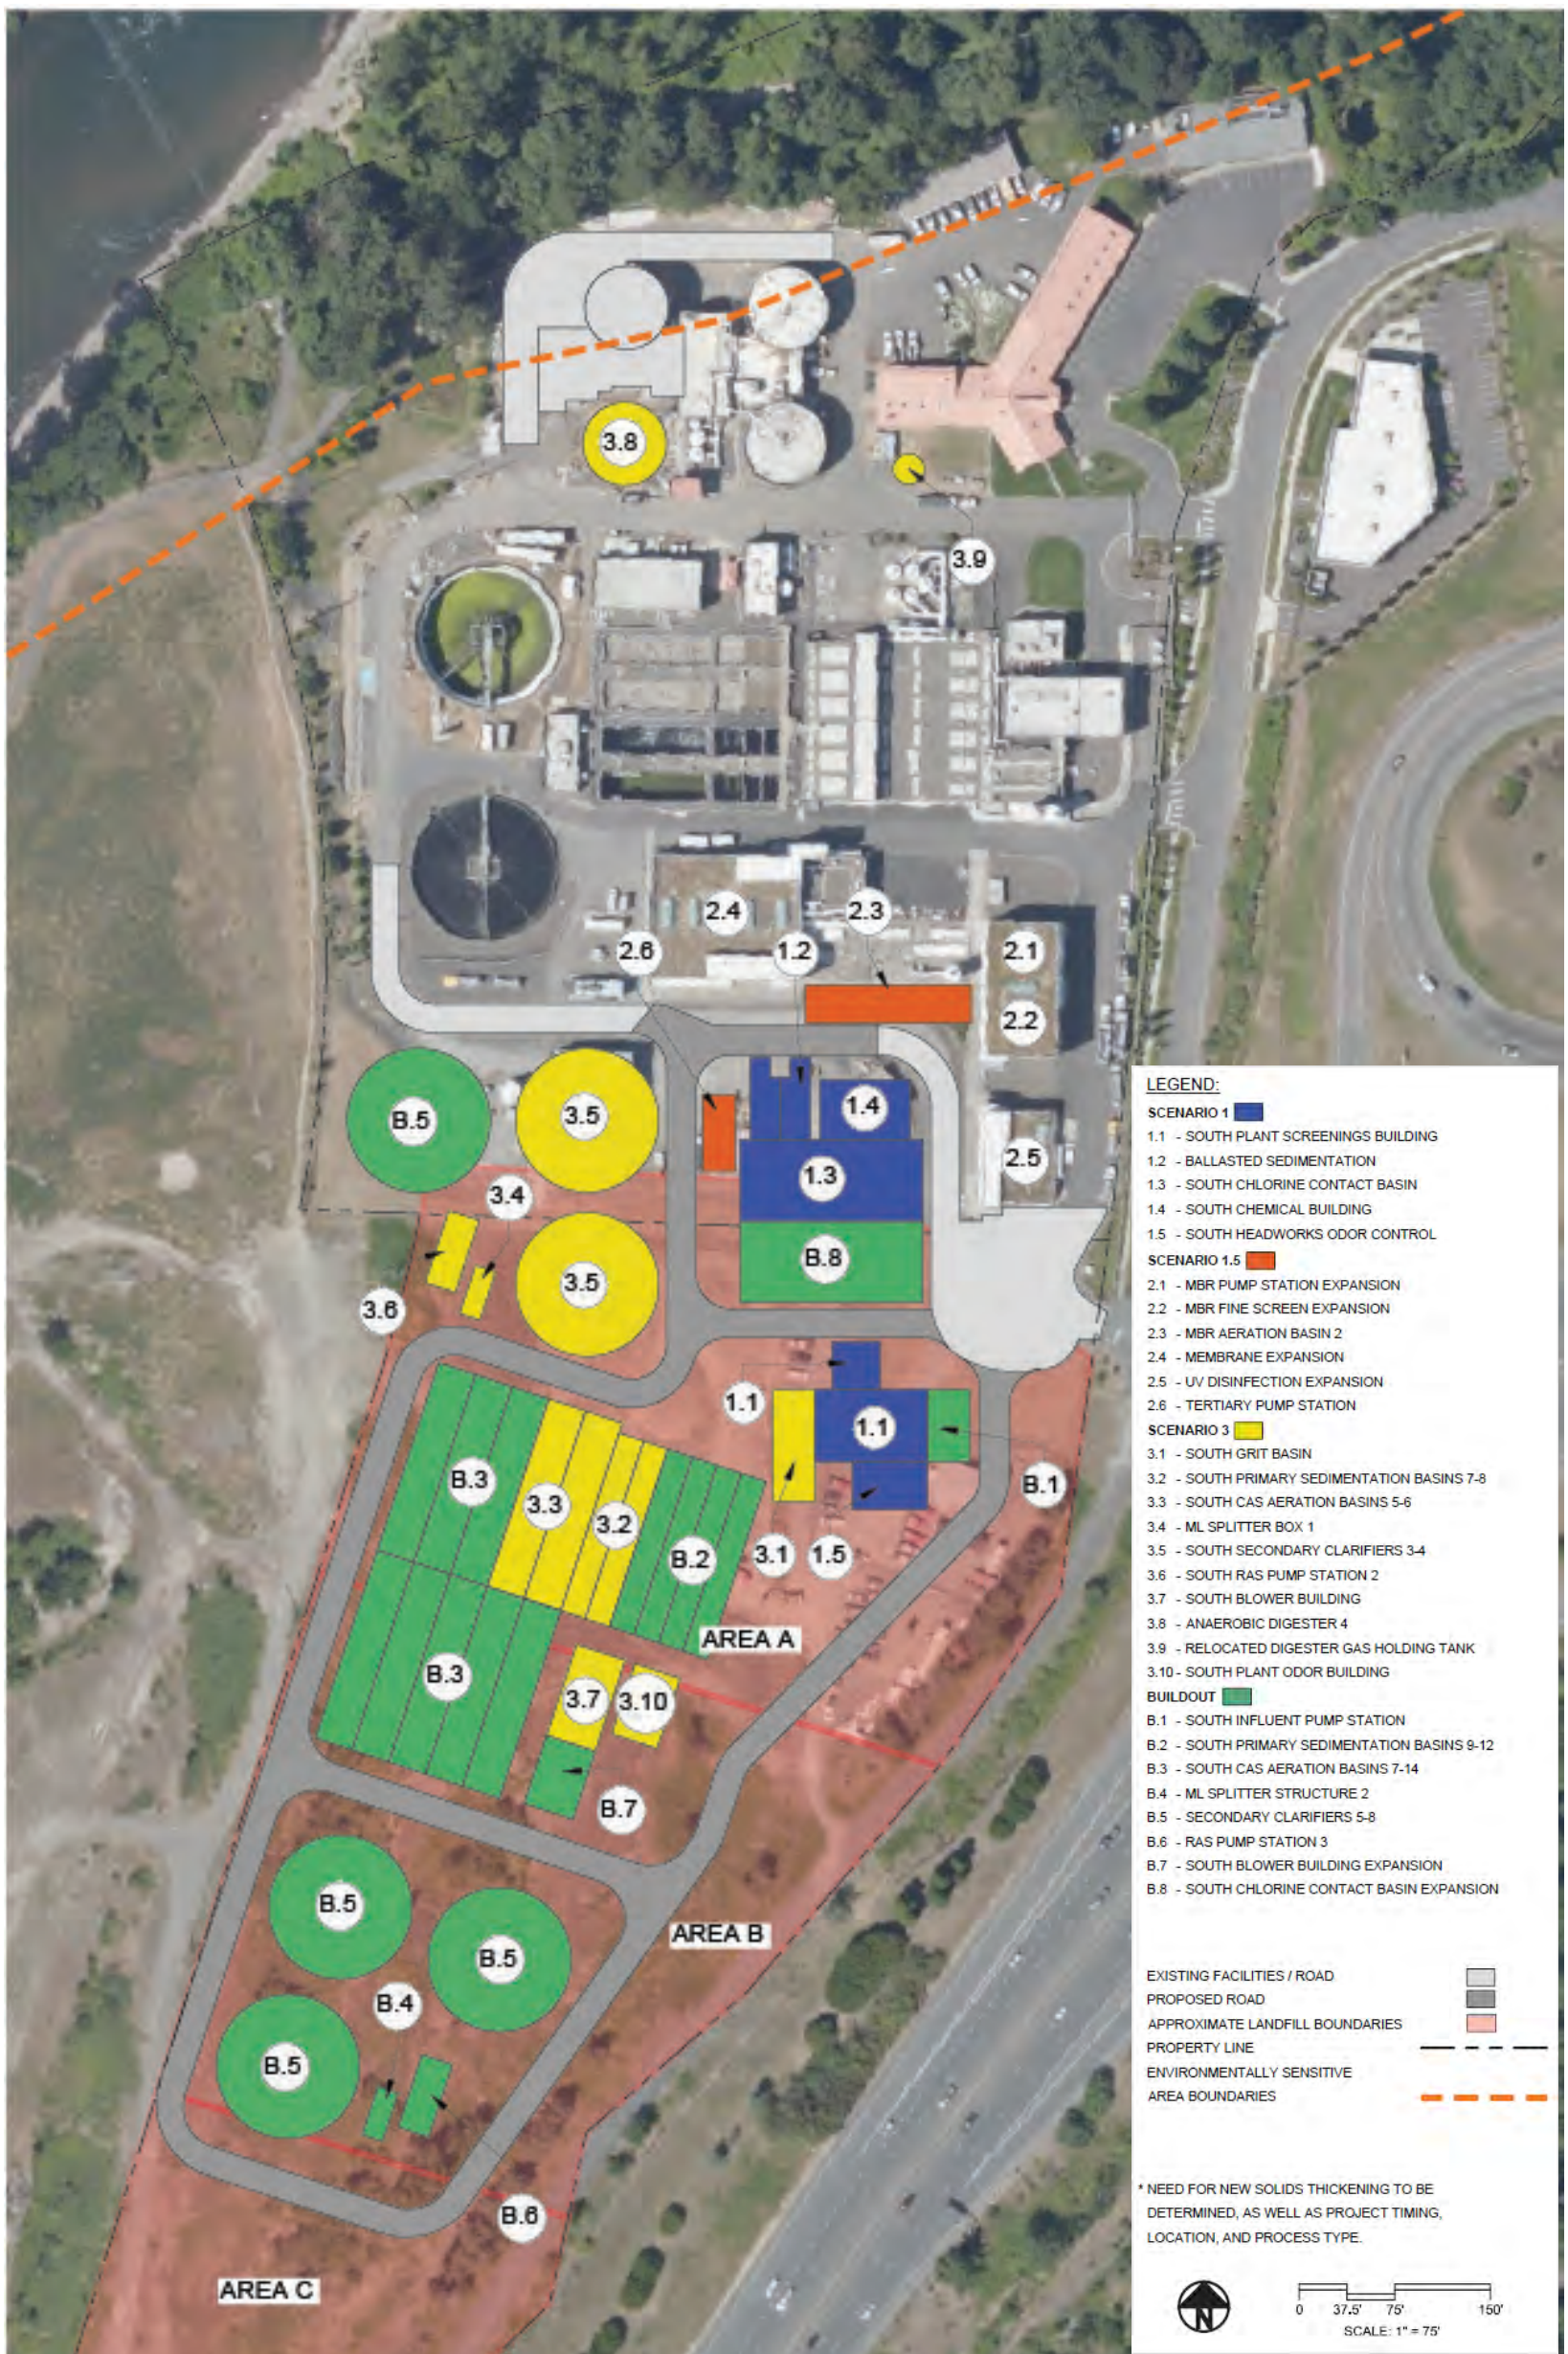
Tri-City WRRF Recommended Alternative Buildout Site Plan
